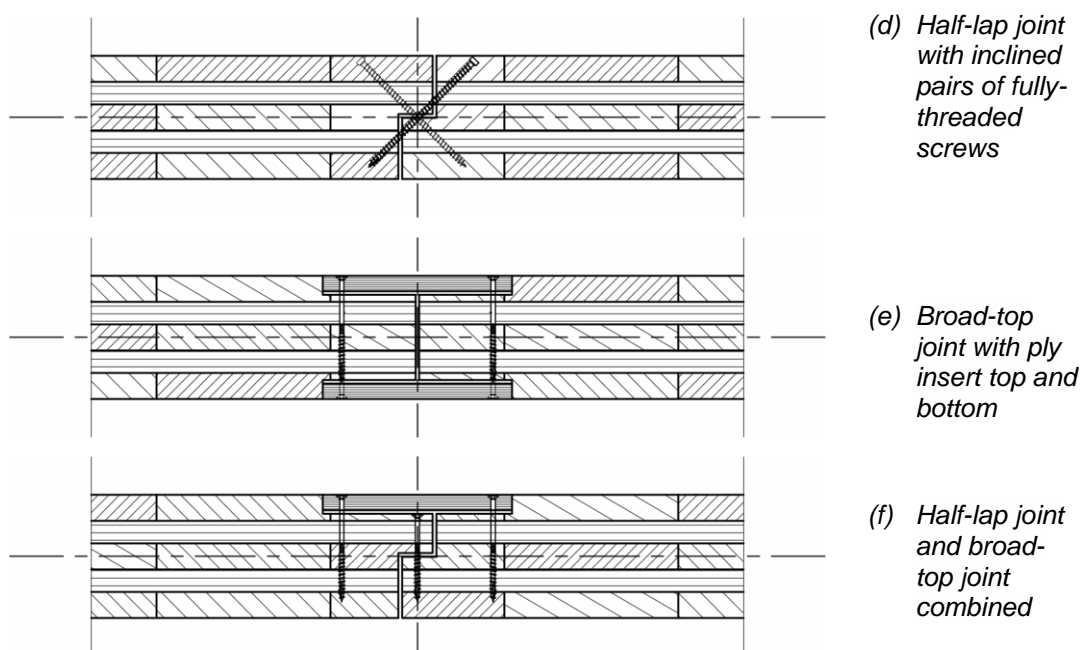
Alternative CLT floor-to-floor panel junction assemblies
